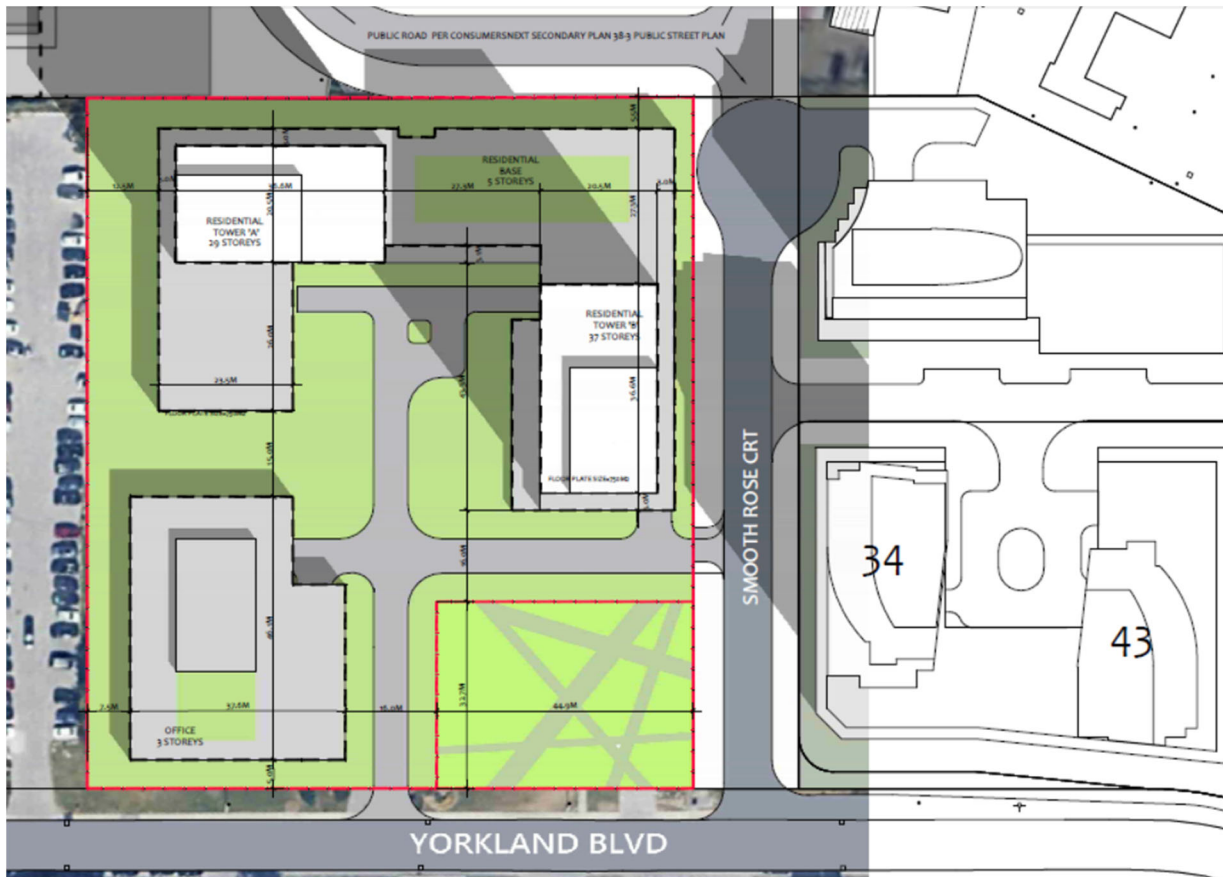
Conceptual Site Plan for Proposed Mixed Use Development
